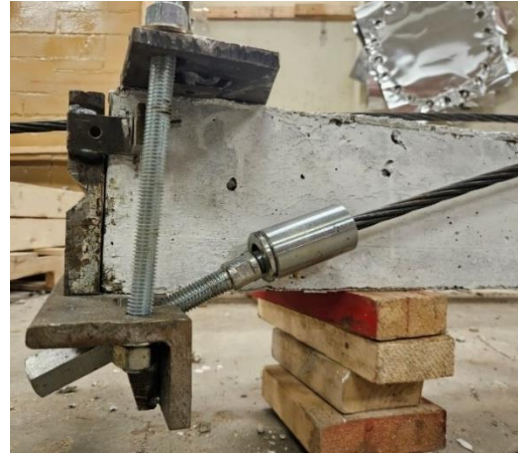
Photo of a column with parabolic profile prior to testing.
